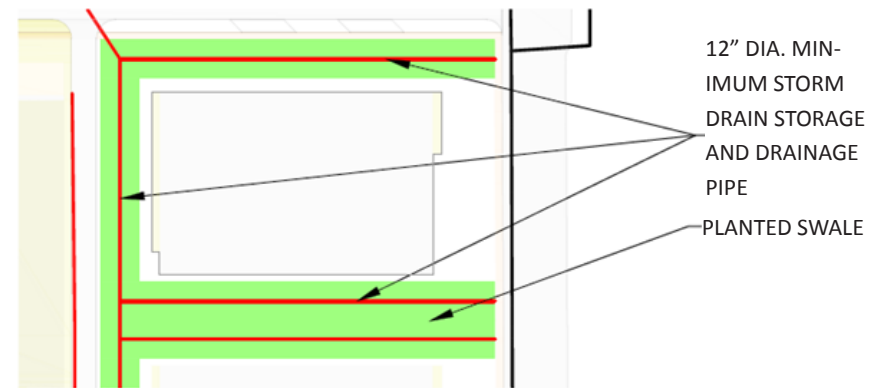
DETAIL OF STORM DRAIN STORAGE AND DRAINAGE PIPE
